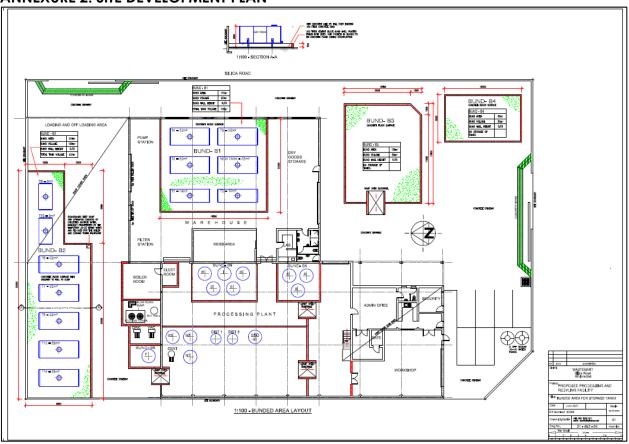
Site development map of Erf No. 40269, Sand Industria indicating the bunded areas and location of the aboveground storage tanks.
